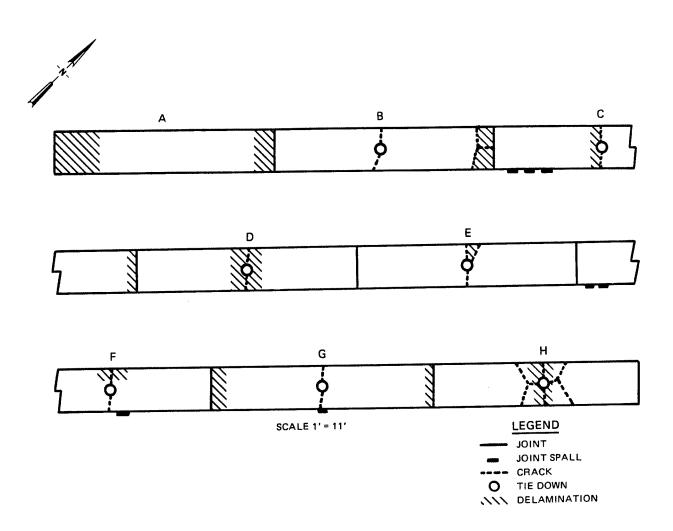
Plan View of W-EP-3 Pad on Northwest End of 13L Runway.
